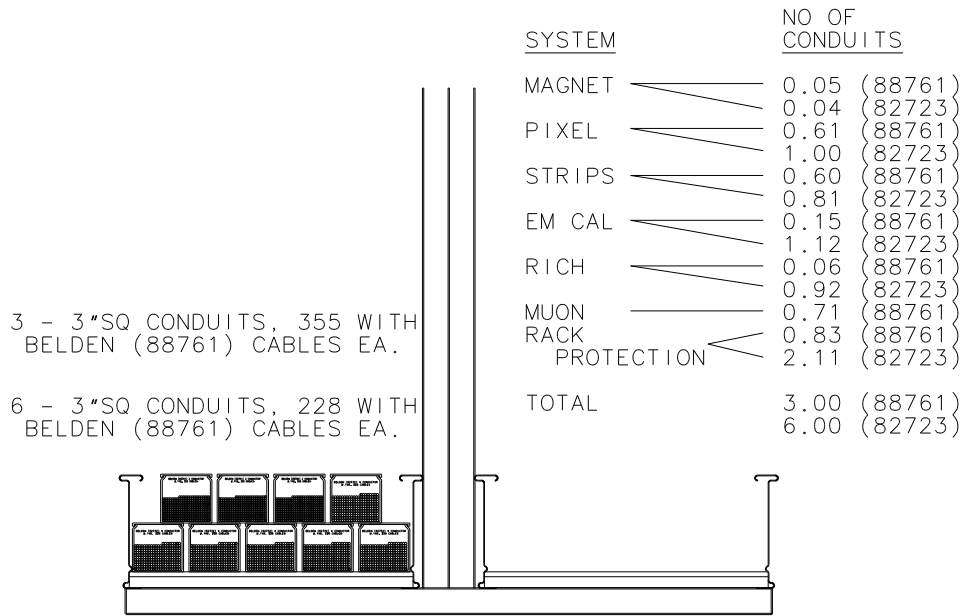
Layout of the slow controls cables in the collision hall cable trays.
